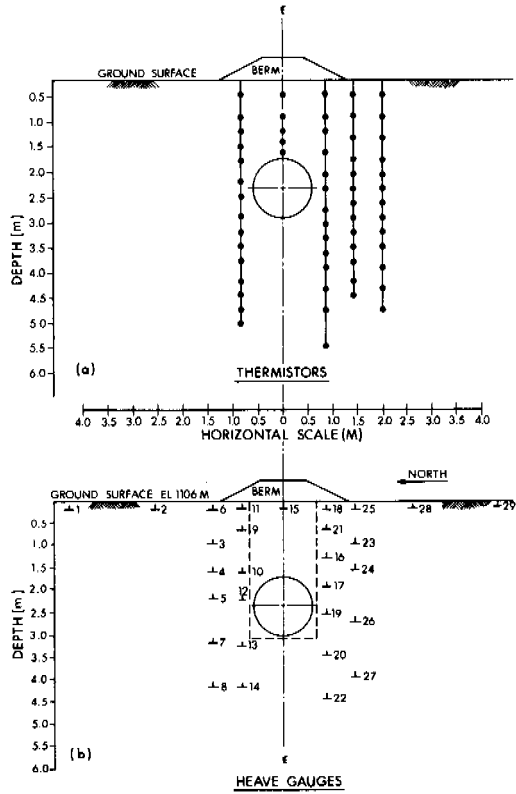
THERMISTOR AND HEAVE GAUGE LOCATION IN DEEP BURIAL SECTION
